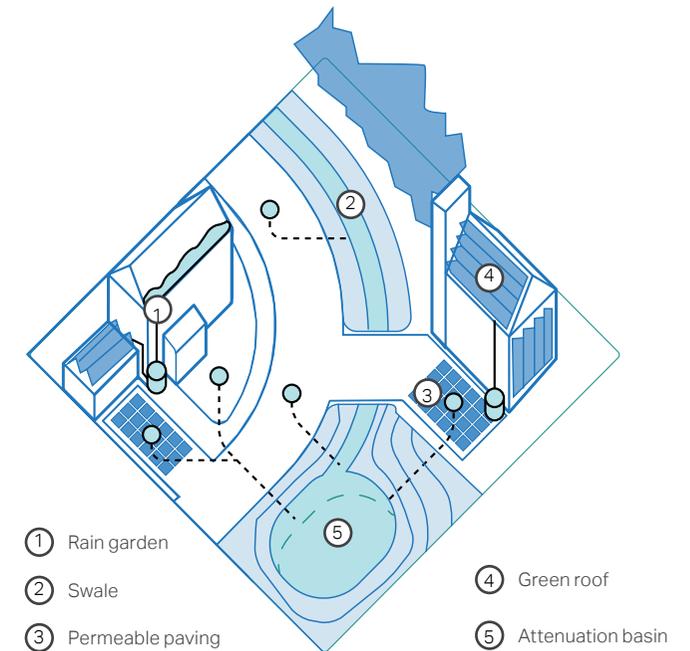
Diagram showing the best use of harvesting water systems rain garden, swales, permeable paving, green roofs
